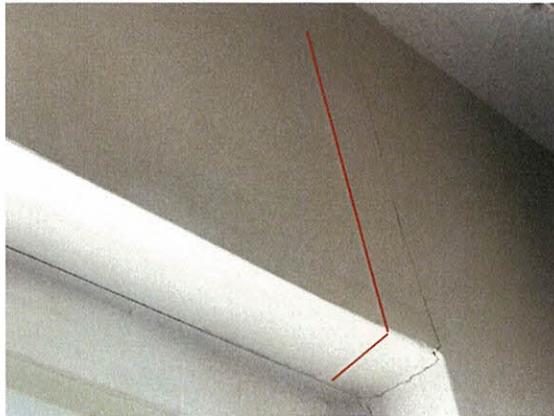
Crack at balcony door header caused by buffeting of doors caused by the winds during the Hurricane.
